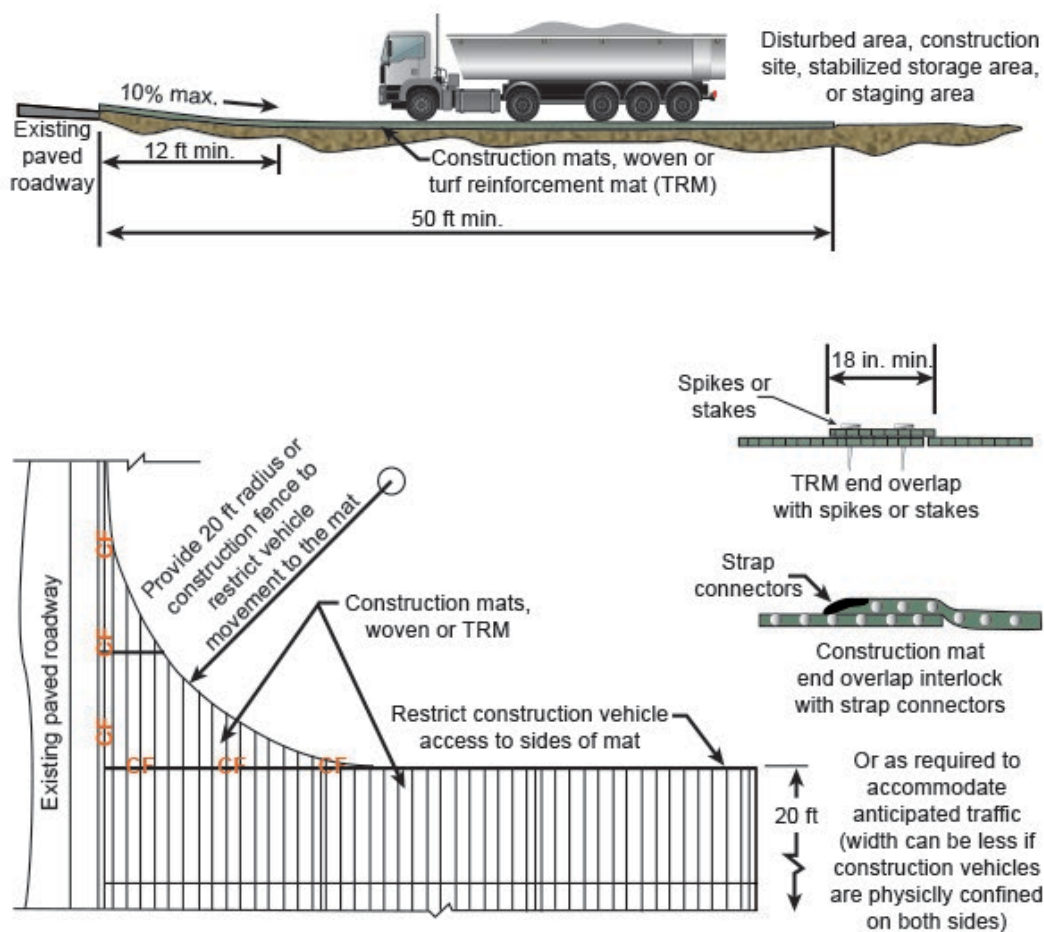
Vehicle-tracking control with construction mat or turf reinforcement mat (Colorado UDFCD 2010).
